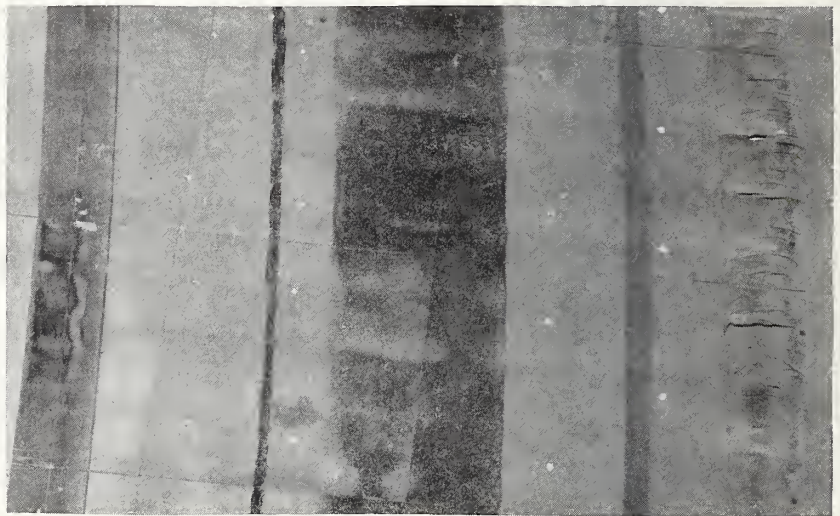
$\frac{1}{8}$ -in. cork-composition tile on strip-wood subfloor (test panel 4L).
